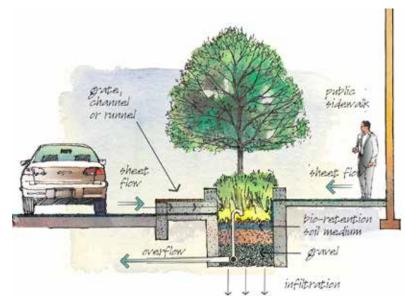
Prototypical example of stormwater infiltration basin
